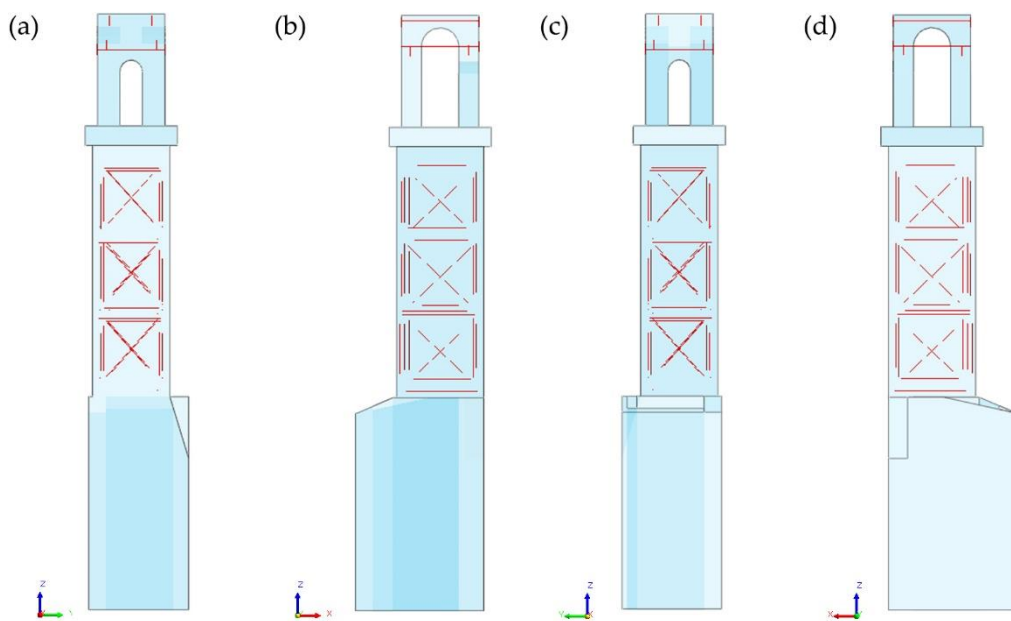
Reinforcing intervention in the numerical models: North (a), East (b), South (c) and West façade (e).
